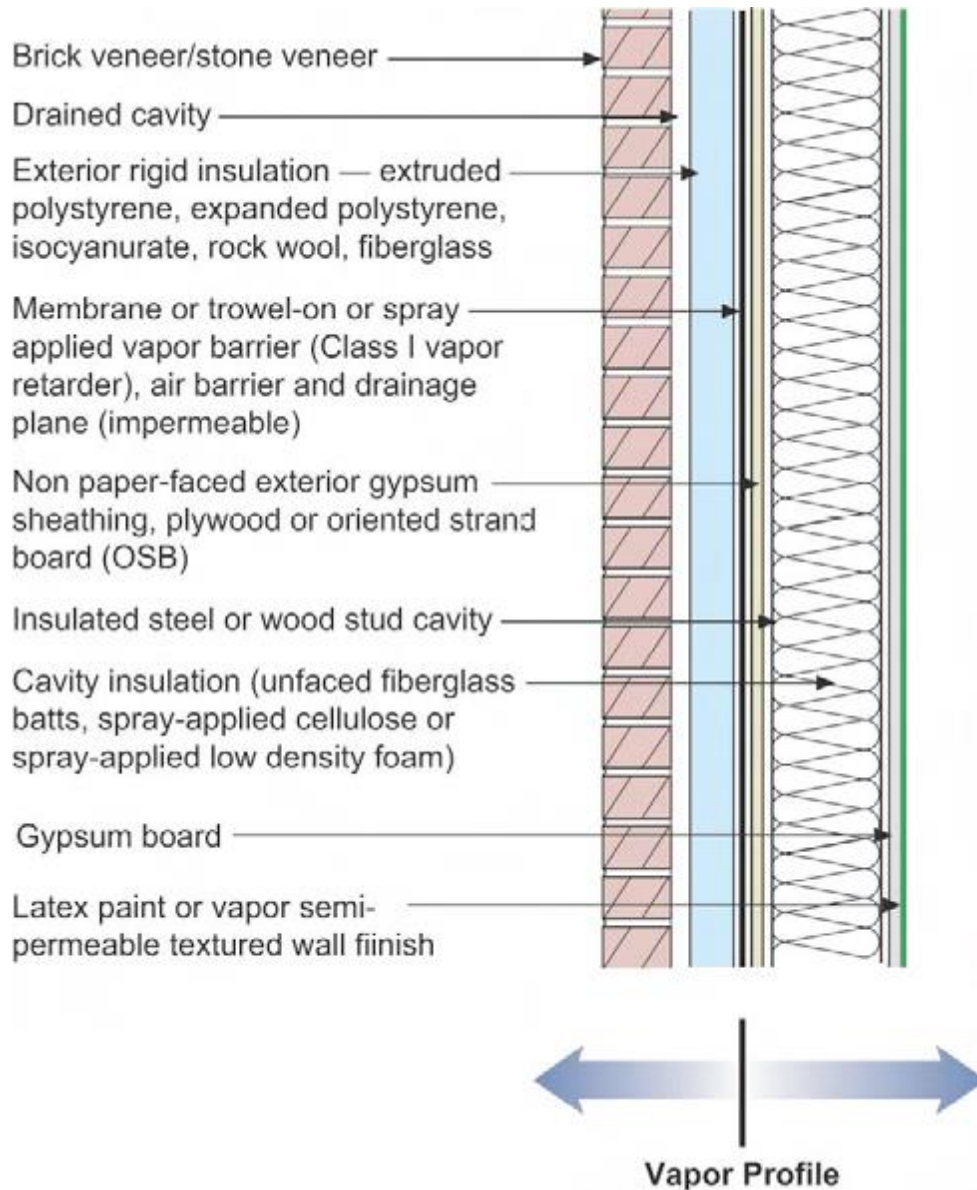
Frame Wall with Cavity Insulation and Brick or Stone Veneer (Joseph, 2005)
